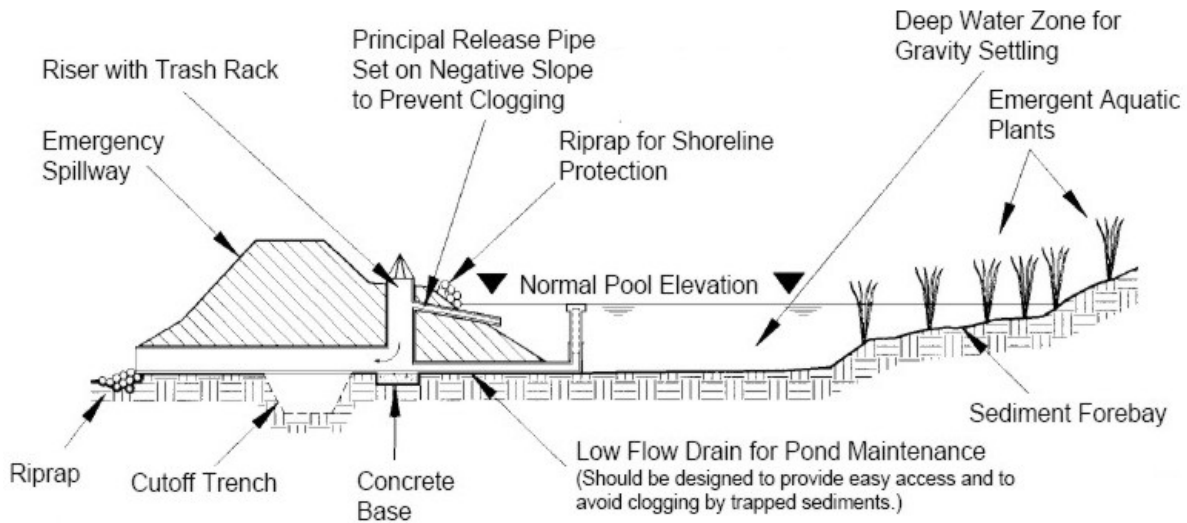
Typical Outlet Structure: Negatively Sloped Pipe Outlet (Northern Virginia Planning District Commission (NVPDC) and Engineers and Surveyors Institute (1992).
